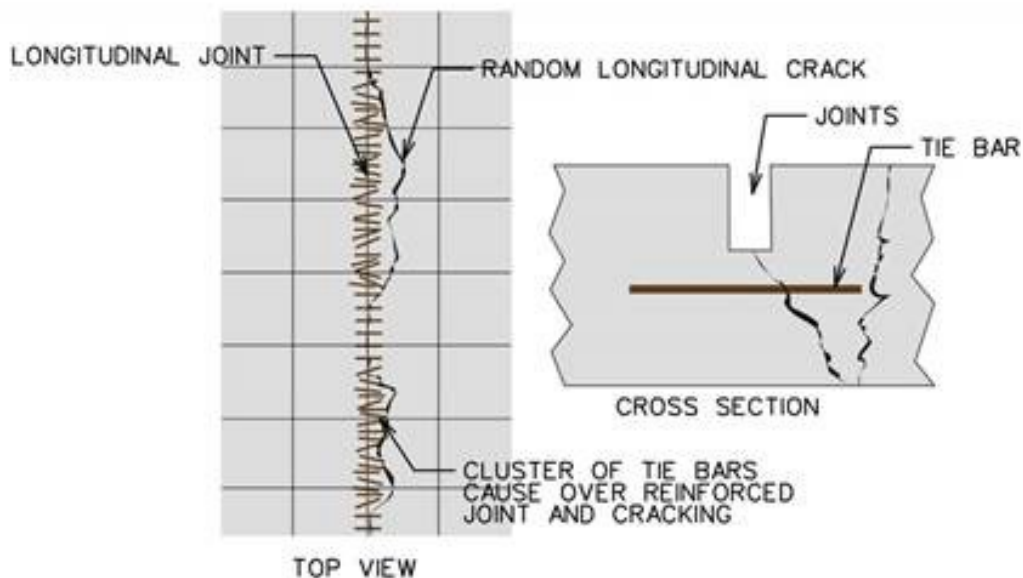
Illustration. Longitudinal cracking along the ends of tie bars on a 7-inch concrete containing tie bars that were clustered together resulting in reinforcing the joint (Harrington et al. 2018).
